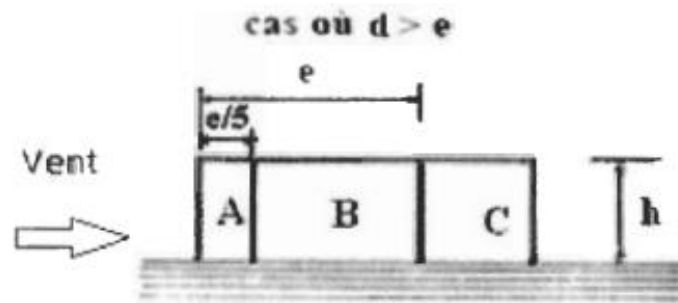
Elevation view of the pressure zones on the vertical walls direction V2
